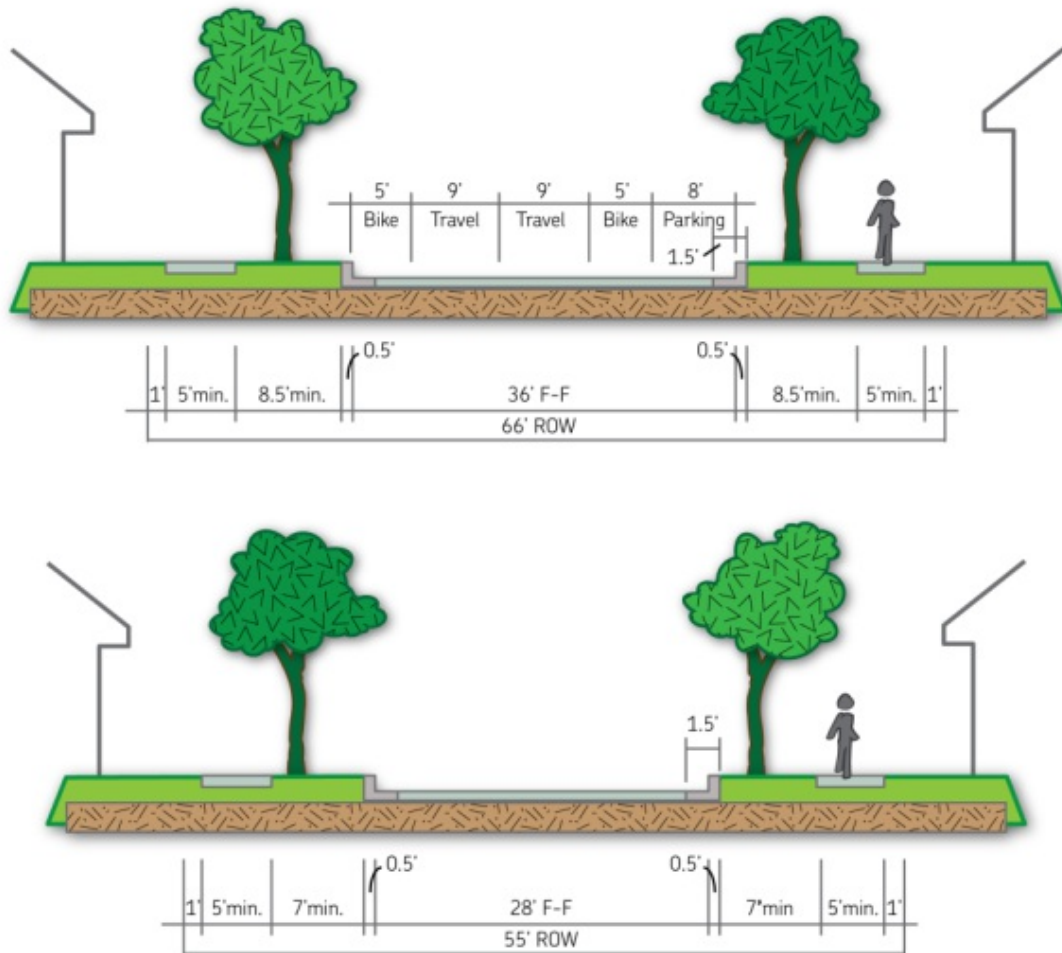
(3): Schematic sketch of a recommended local street cross-section with two-sided parking.
